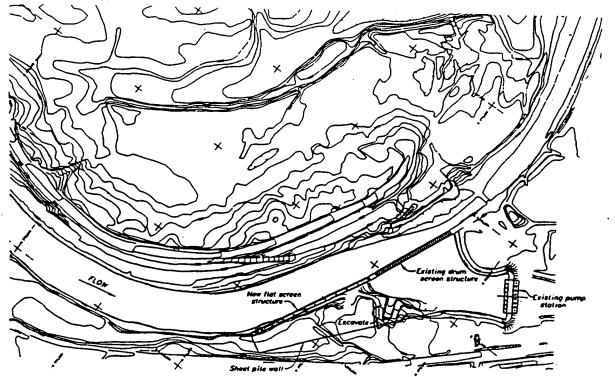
Conceptual layout. Plan view of the proposed D alternative flat panel fish screen structure.
